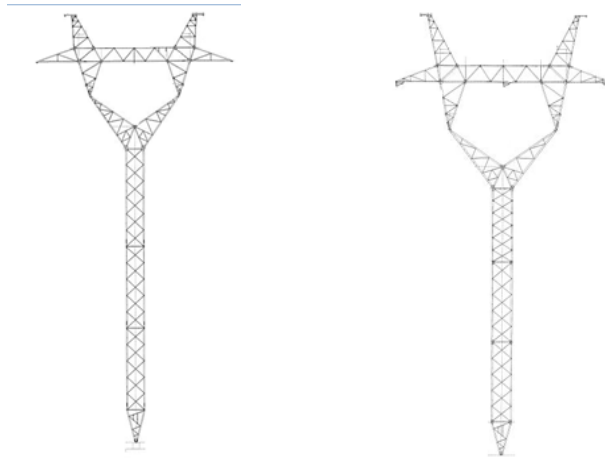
Type A Tower (Left) and Type B Tower (Right)
